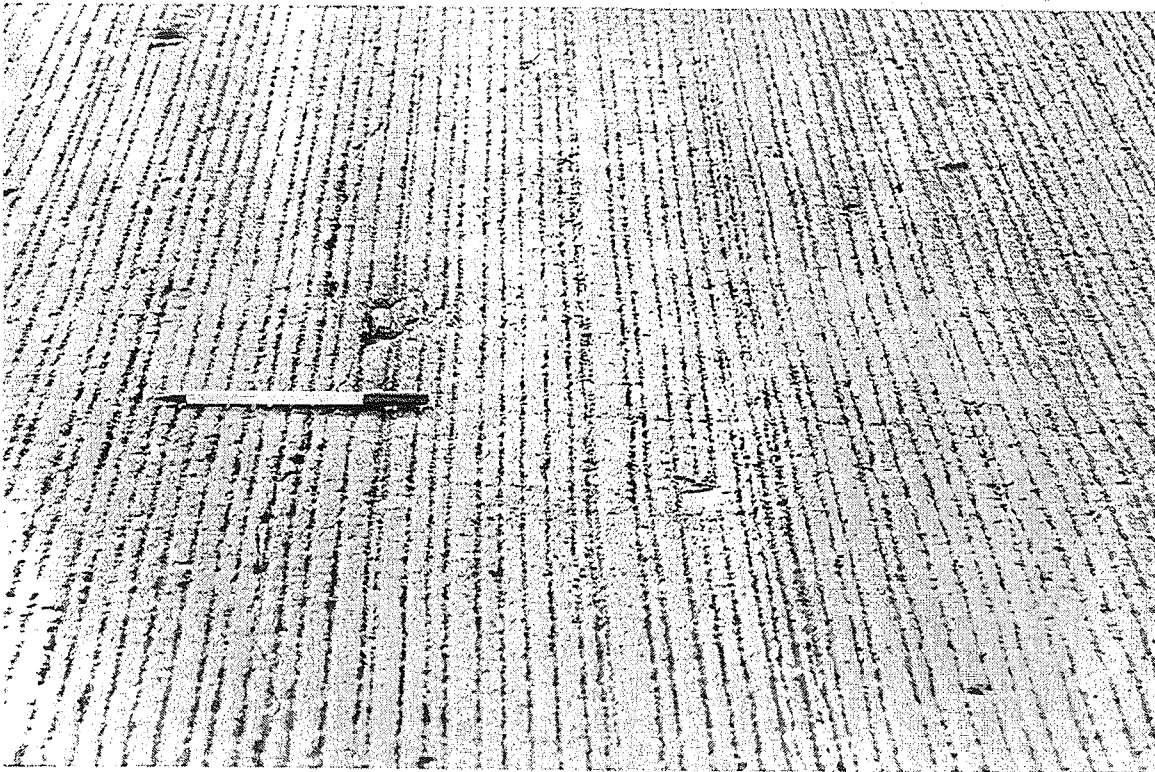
A closeup view of a tight crack on CSN# 19043-02234A, WB. The beginning of spalling can be seen in the center of the photo.
